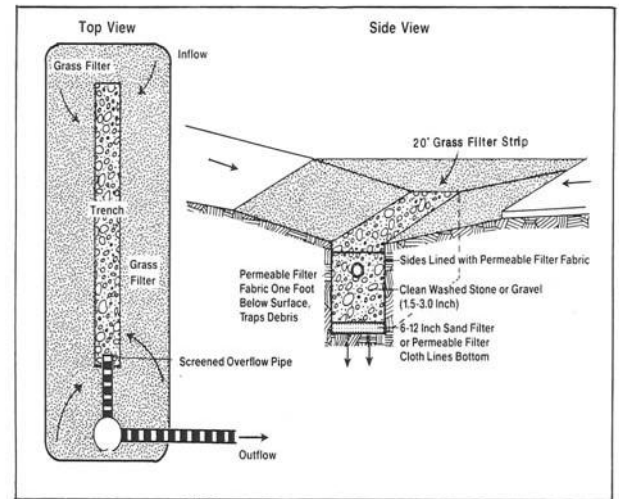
illustrates a typical cross-sectional view of a drywell and Figure IT-2 shows an infiltration trench.
